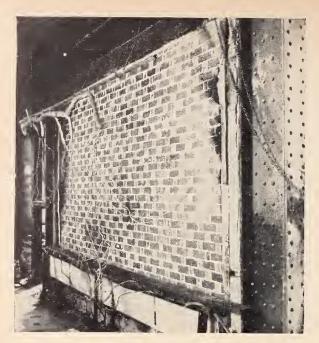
Unexposed side of 8-in. all-rolok wall 59 after 6-hr fire test under load of 160 lb/in. 2 of gross area.
